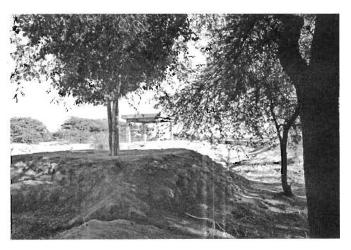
In the background sits a concrete shade structure built for the villagers to gather and rest while they planned and built their earthworks. The earthworks now support the shade trees in the foreground.
